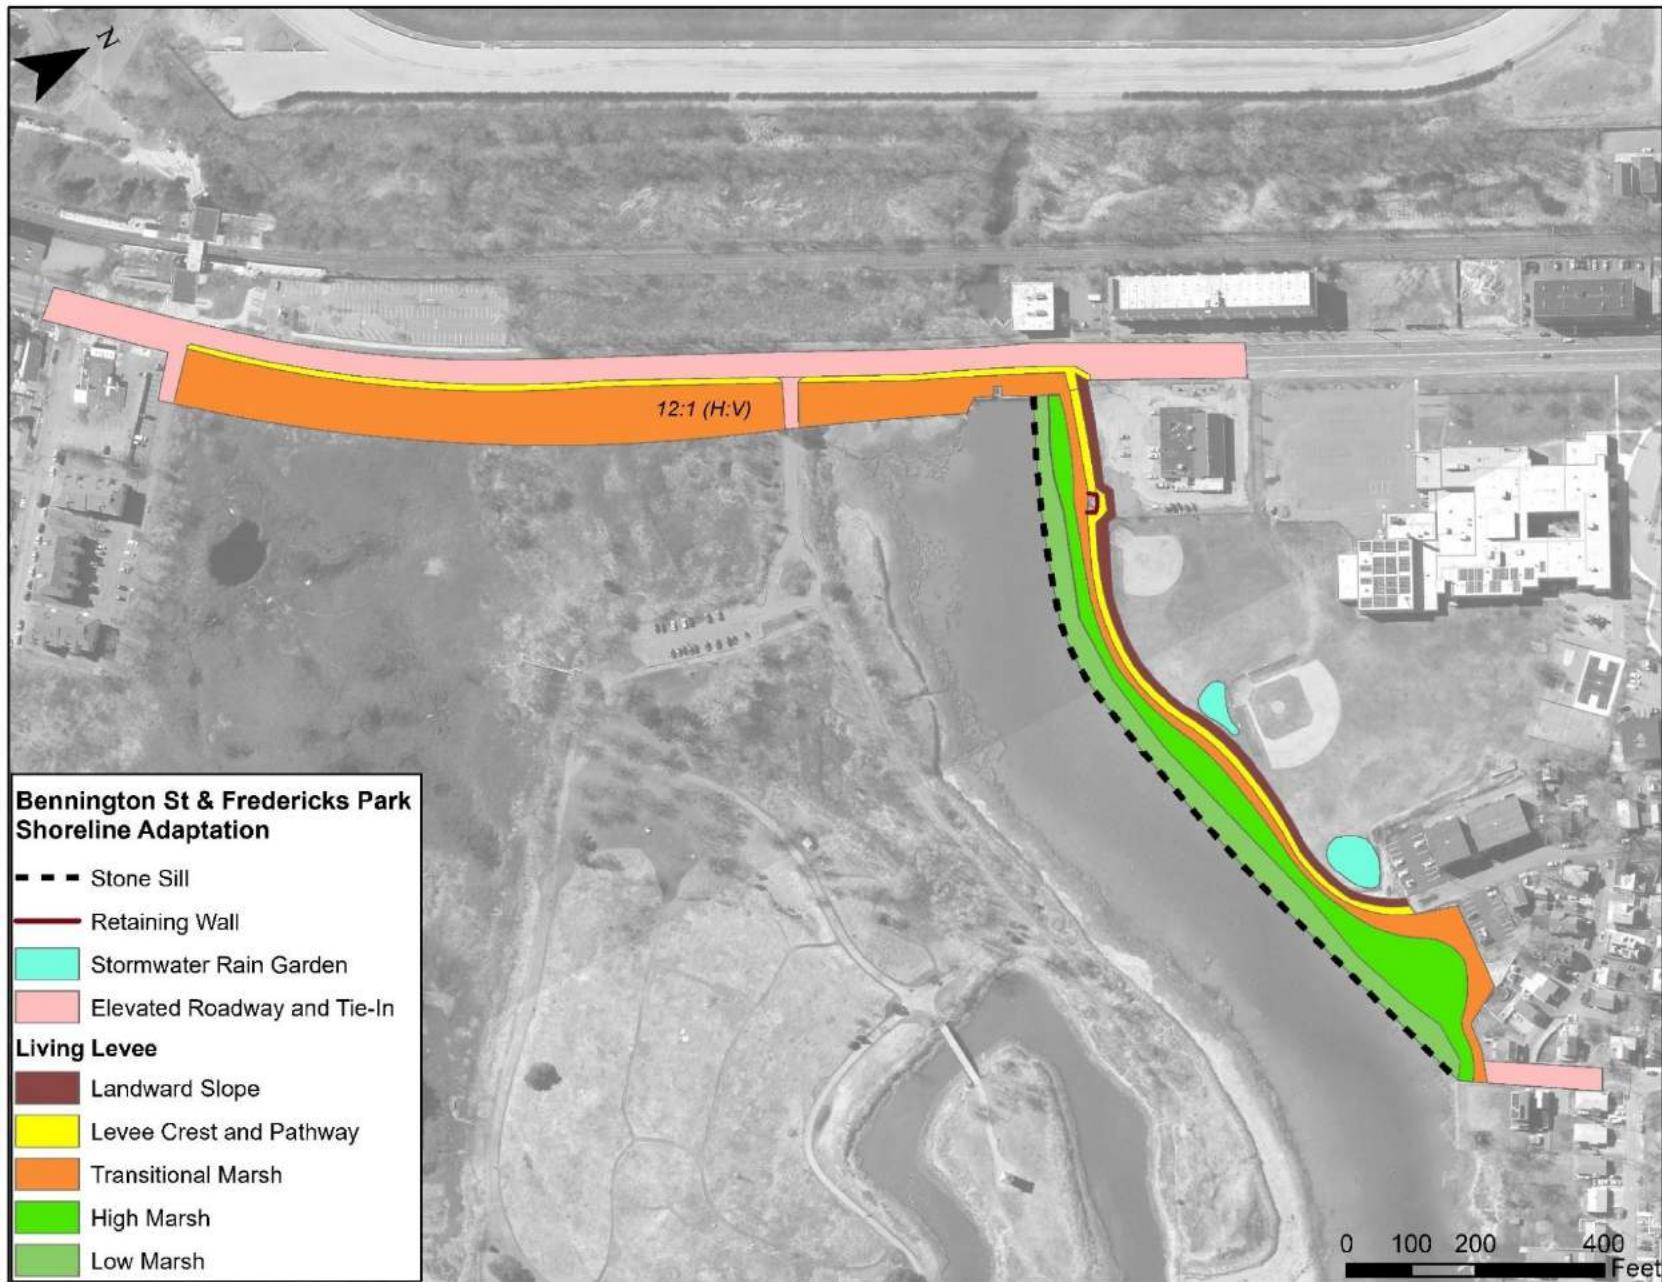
Bennington St and Frederick's Park – Living Levee and Elevated Roadway.
